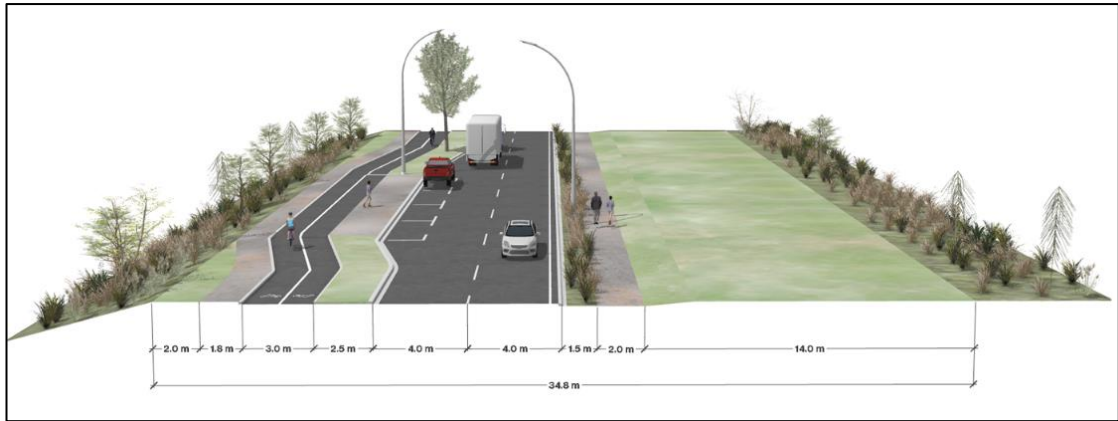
a) Indicative Typical Cross-Section for the East-West Local Road .
